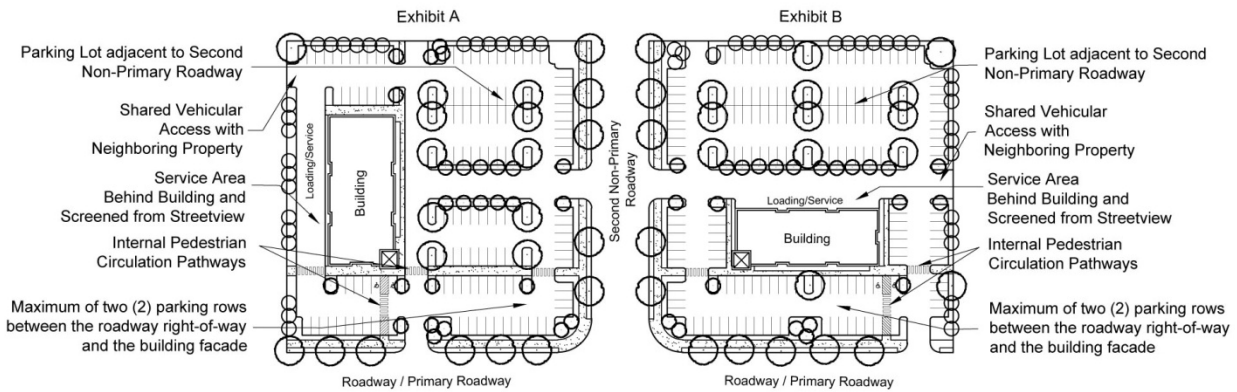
(c).2 – Site Layout - Parking Standards – Smaller Sites
